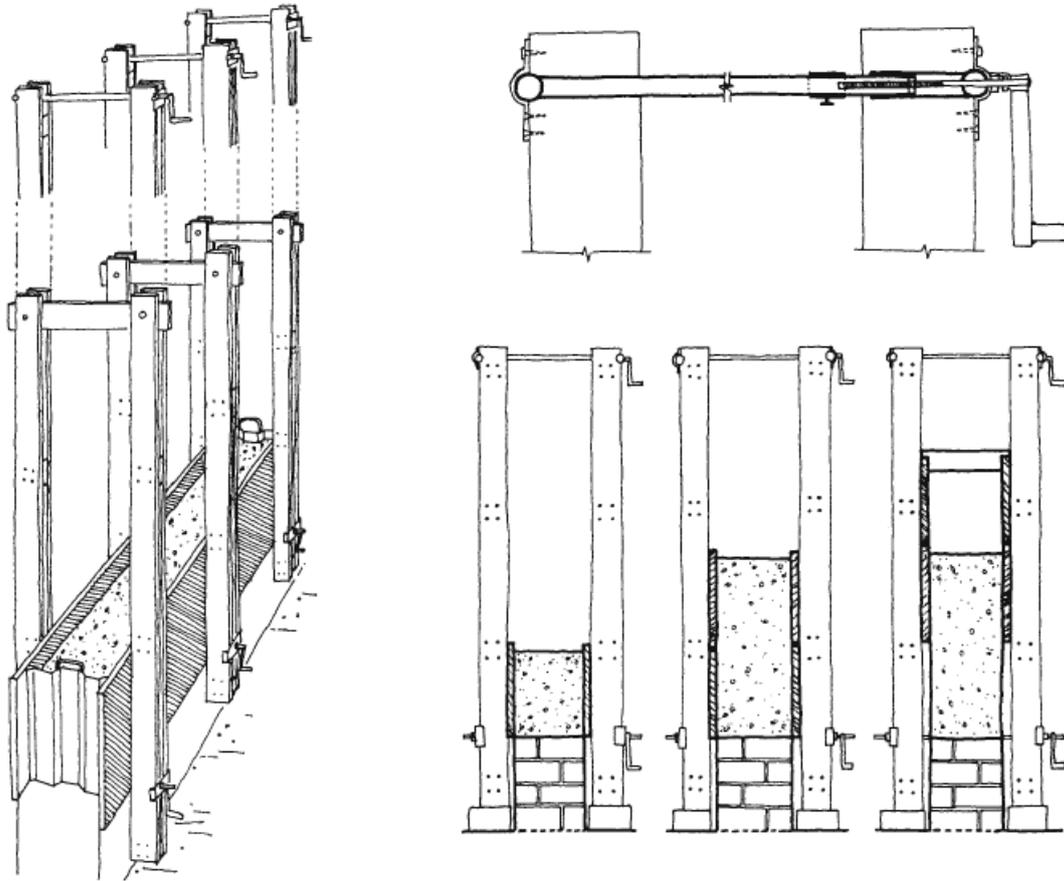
Sliding formwork for rammed earth panels. Source: *Building with earth Design and Technology of a Sustainable Architecture
